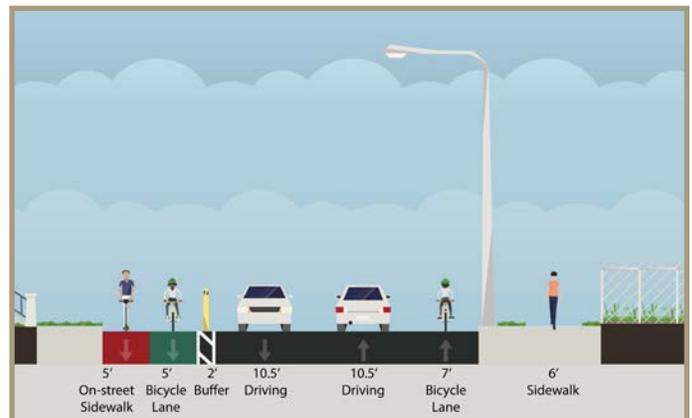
Proposed conditions on N. 13th Avenue between Louis Street and Bleacher Street.
